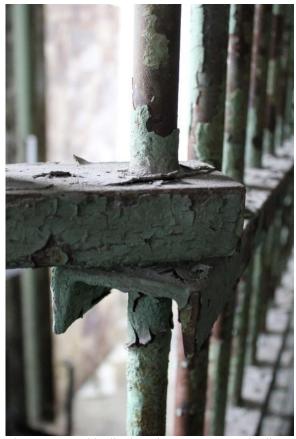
, Old Jail, First Floor, Room 106, detail view of heavy paint loss and rust at metal bars.
